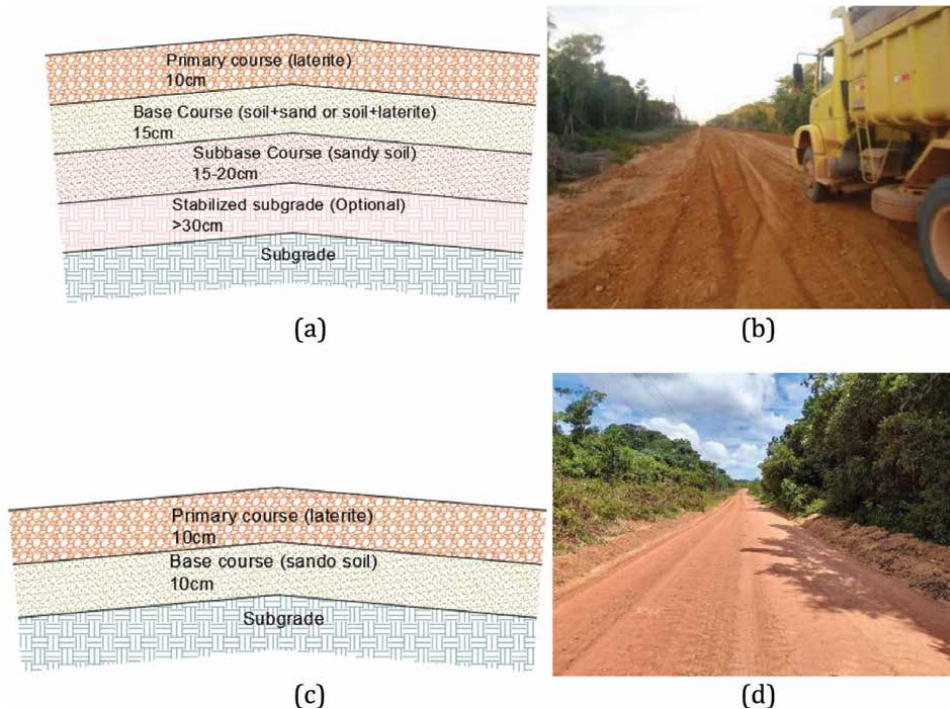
Use of *piçarra* on highways. (a) Typical profile of the pavement courses for high traffic volume; (b) execution of the primary coating layer; (c) typical profile of the pavement layers for low traffic volume; (d) condition of the primary coating layer performed over decades (photos: NS Campelo).
